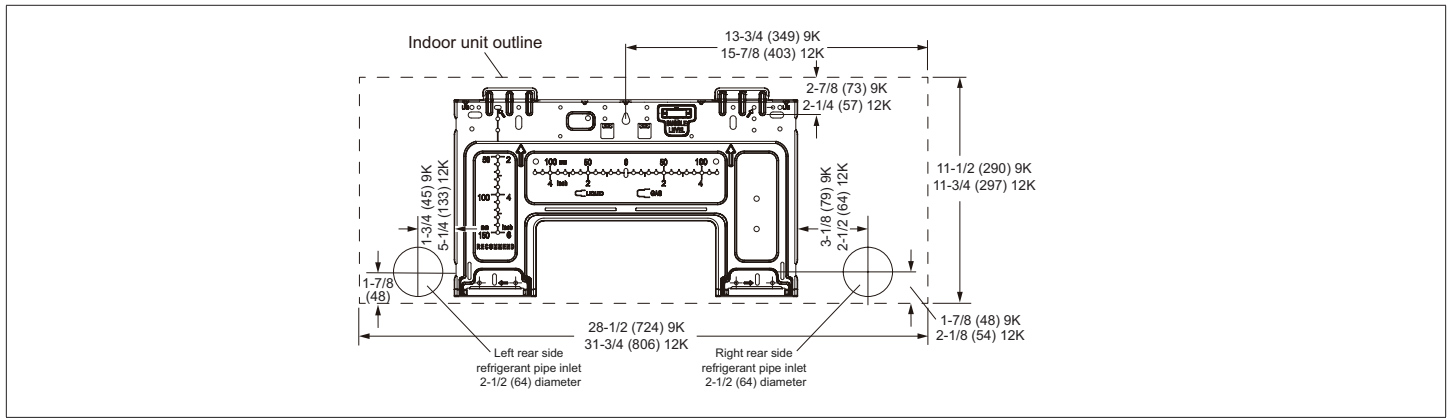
9K and 12K Indoor Unit Wall Plate Dimensions - Inches (mm)
